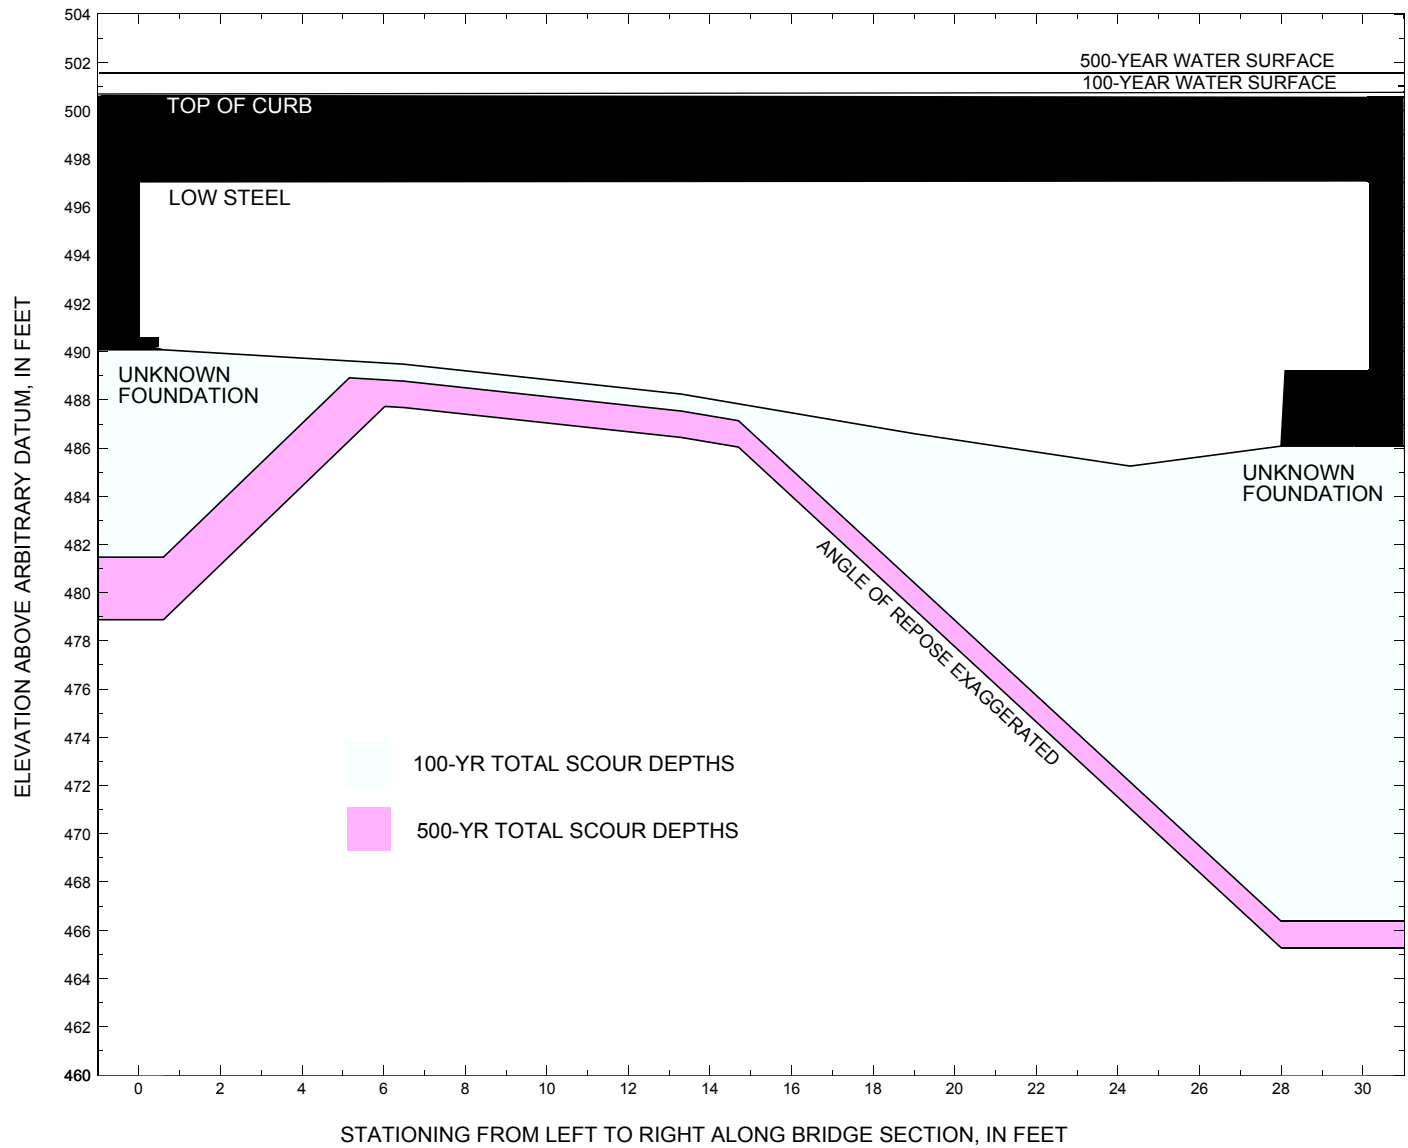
Scour elevations for the 100-yr and 500-yr discharges at structure SHARTH00040013 on Town Highway 4, crossing Broad Brook, Sharon, Vermont.
